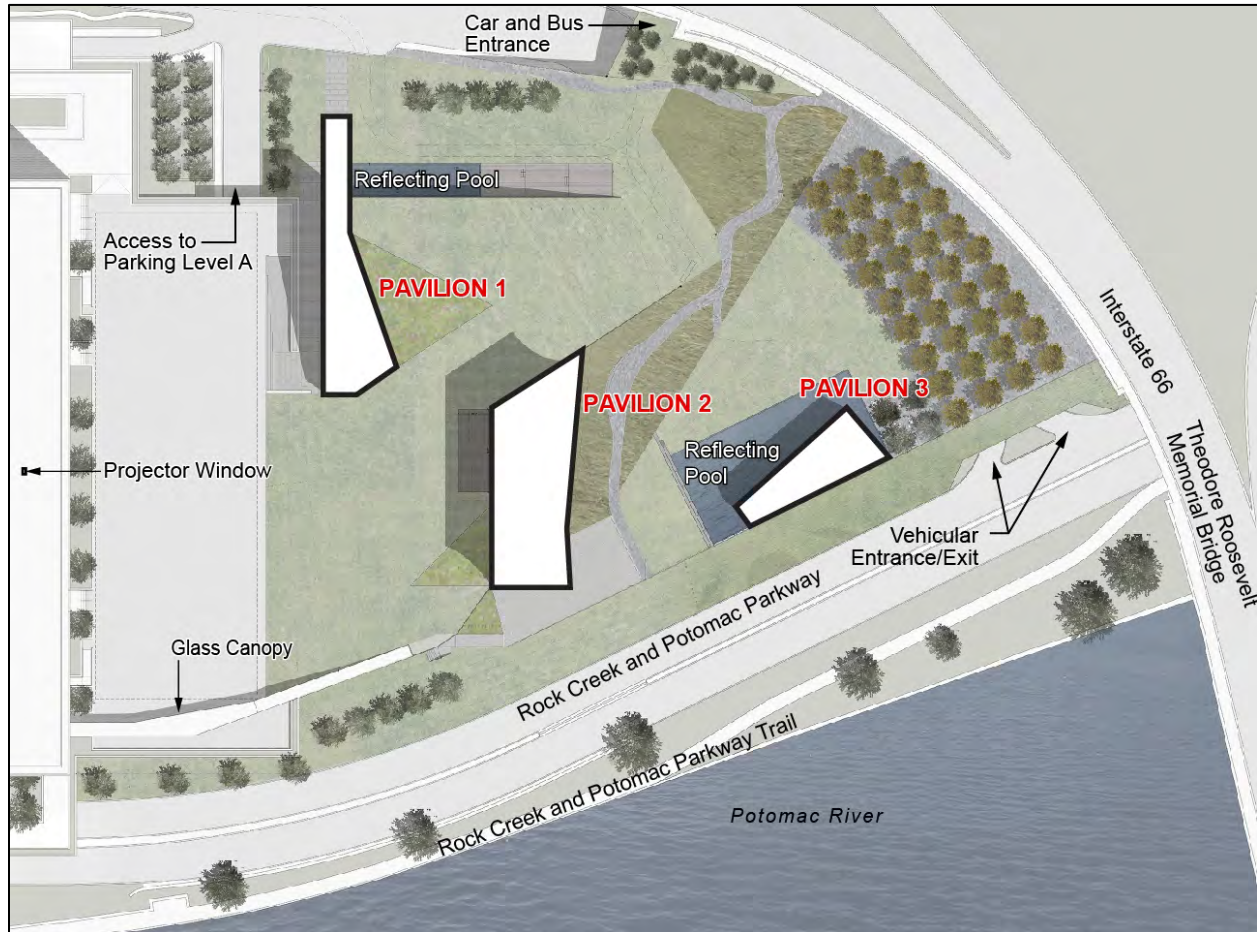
Alternative B – Three Land-Based Pavilions, plan view (not to scale).
